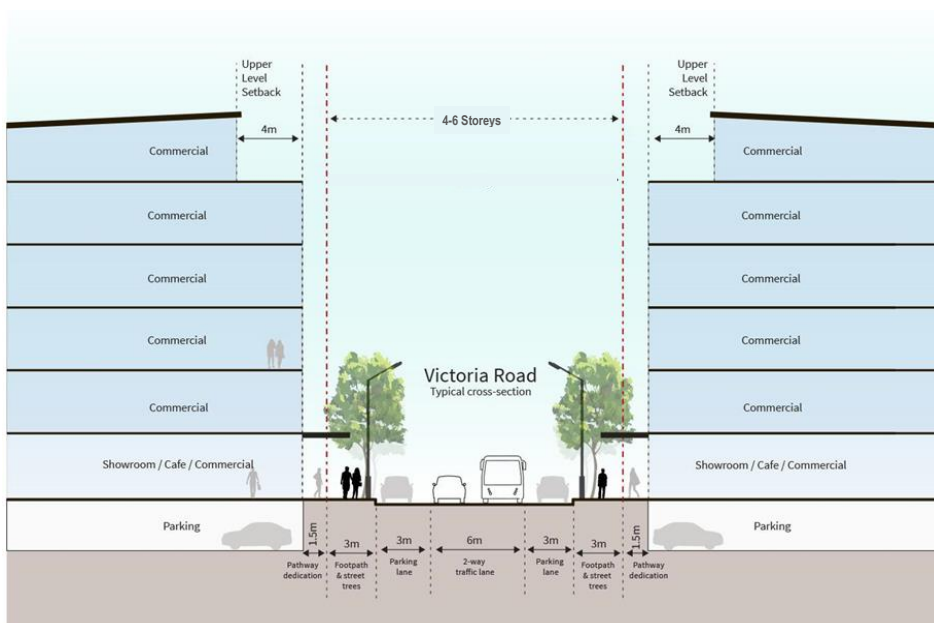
Street section 2 - Victoria Road (B5 Business Development zone)
